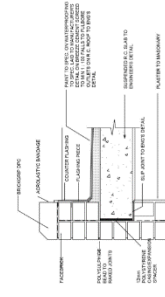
Waste Bunker-Concrete Precast Panel
